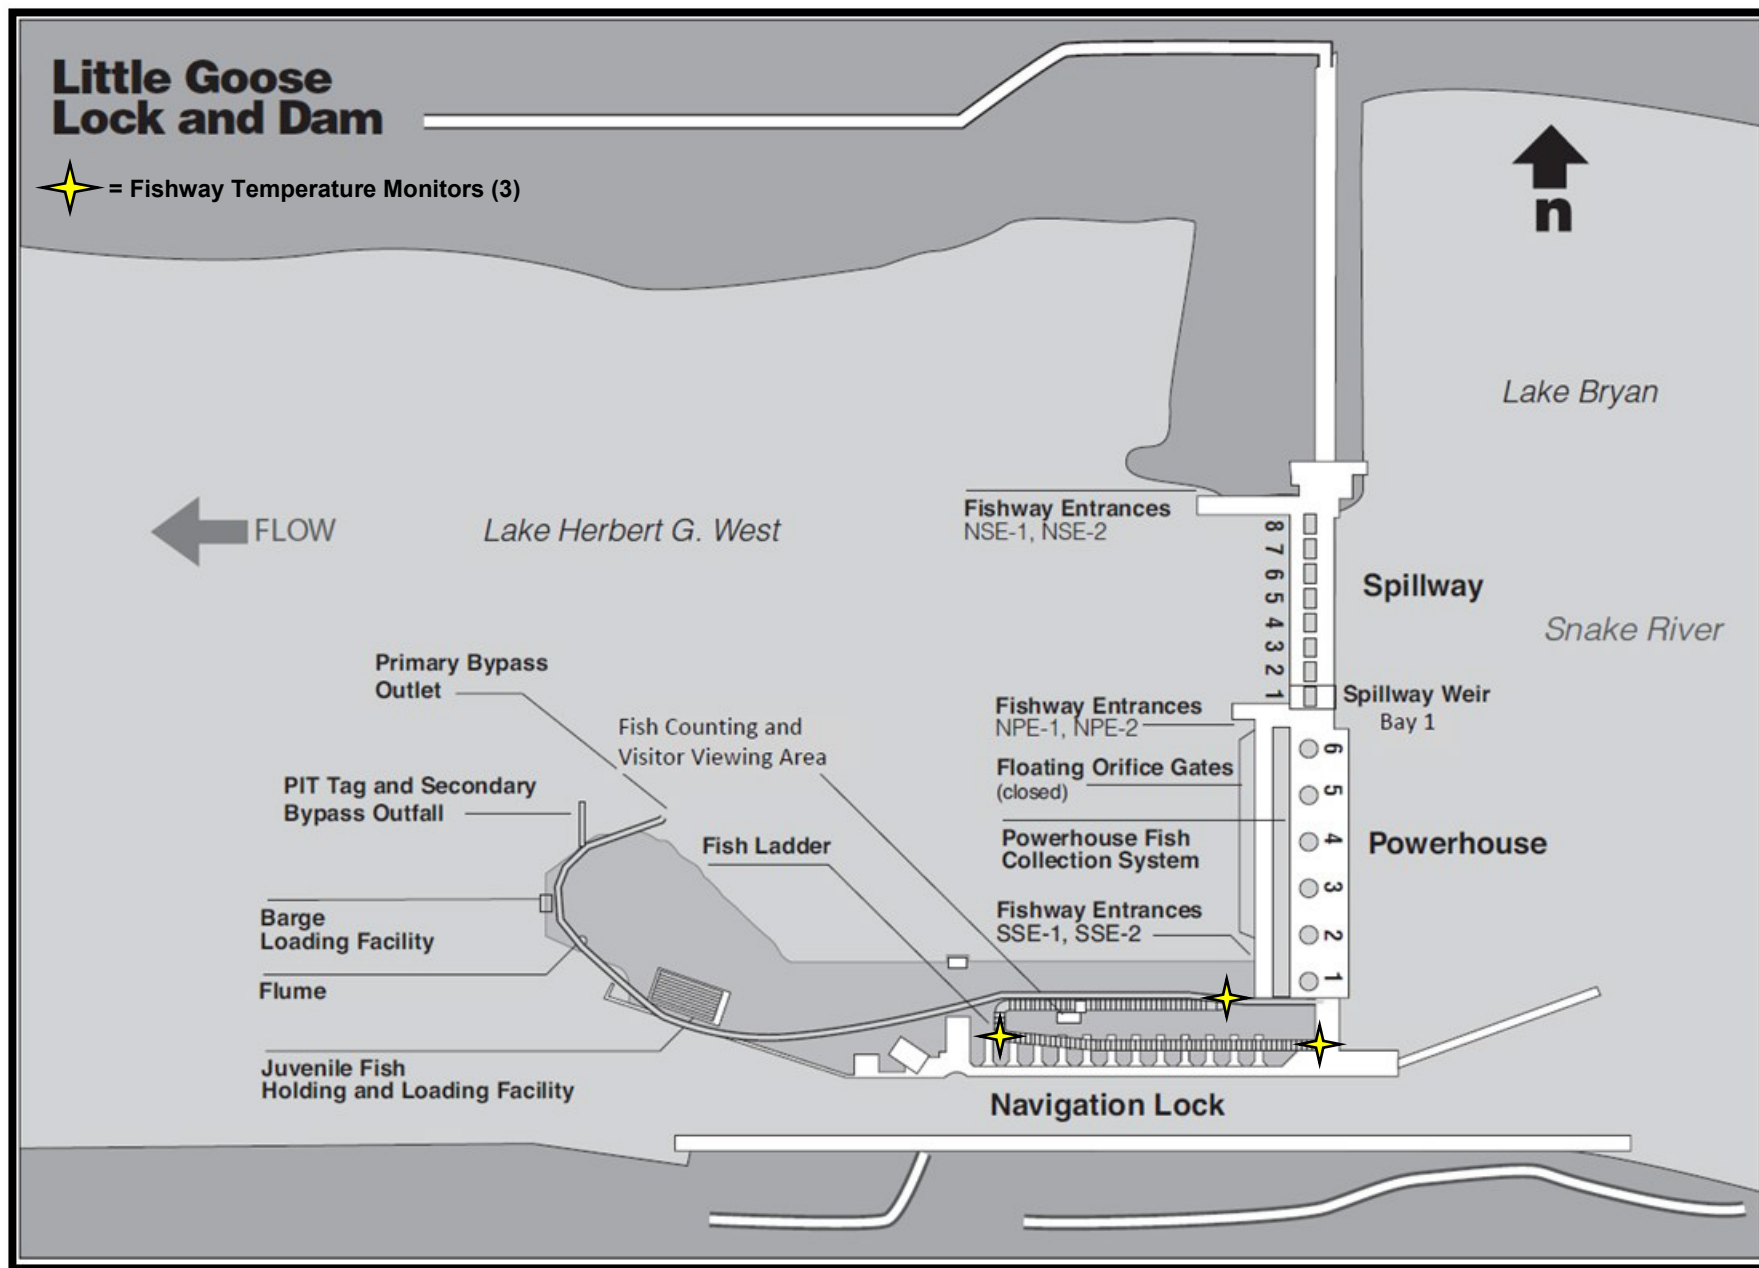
Little Goose Lock & Dam General Site Plan.
